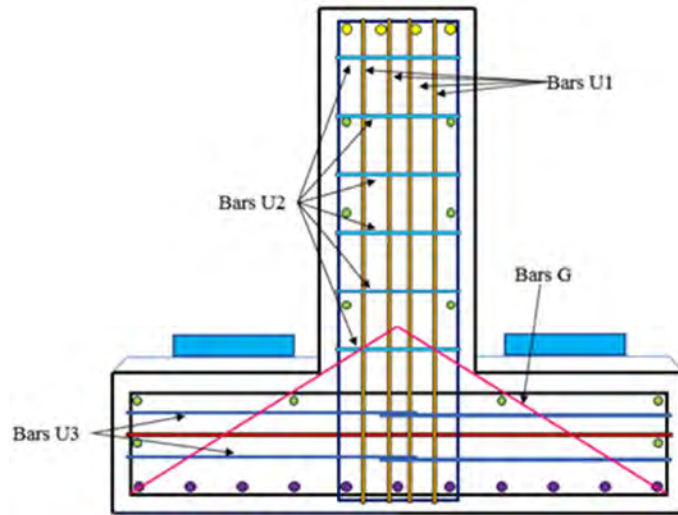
End Face Section View of 30 Degrees Skewed ITBC
